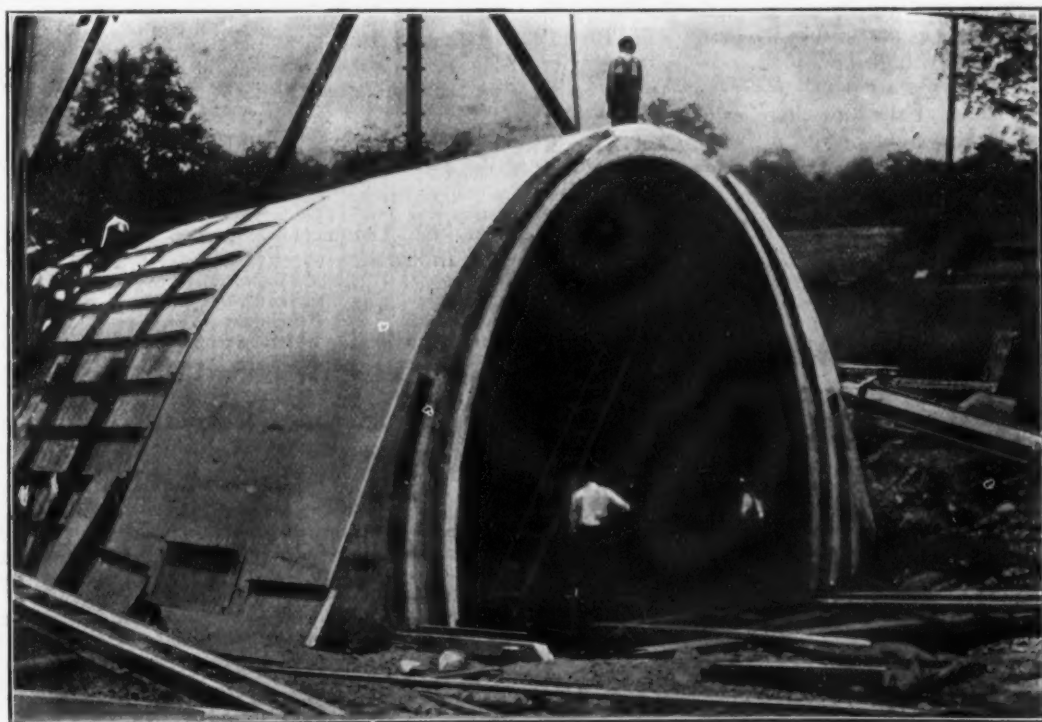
First Section of the Catskill Aqueduct, Formed on Blow Collapsible Steel Centering.
